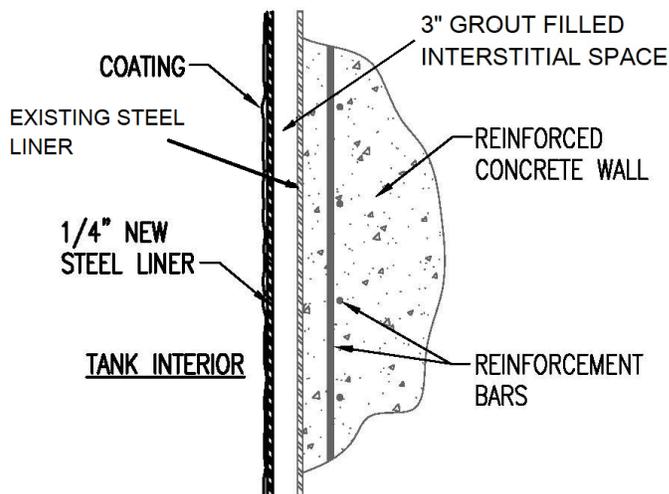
Tank Upgrade Alternative 2A - Typical Wall Section
